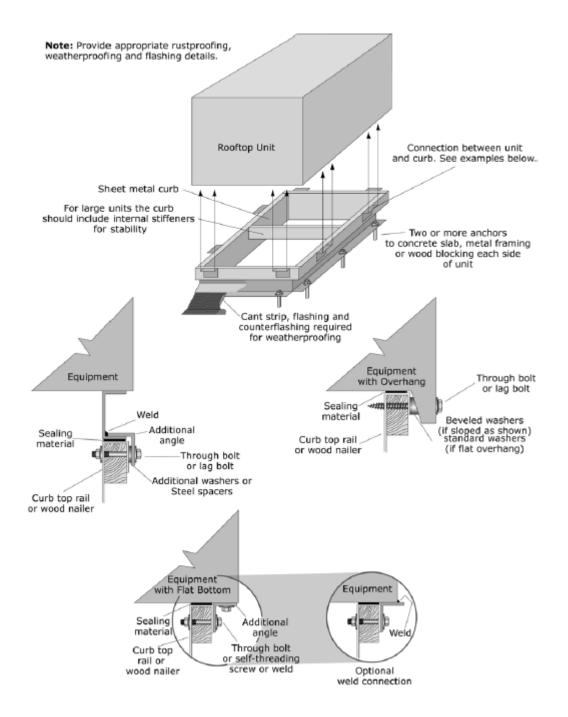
Rooftop HVAC Equipment. (FEMA E-74, 2012, Reducing the Risks of Nonstructural Earthquake Damage)
